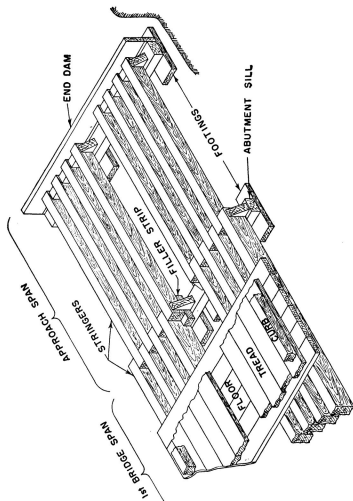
Abutment showing approach span used for soft road-way approach.
